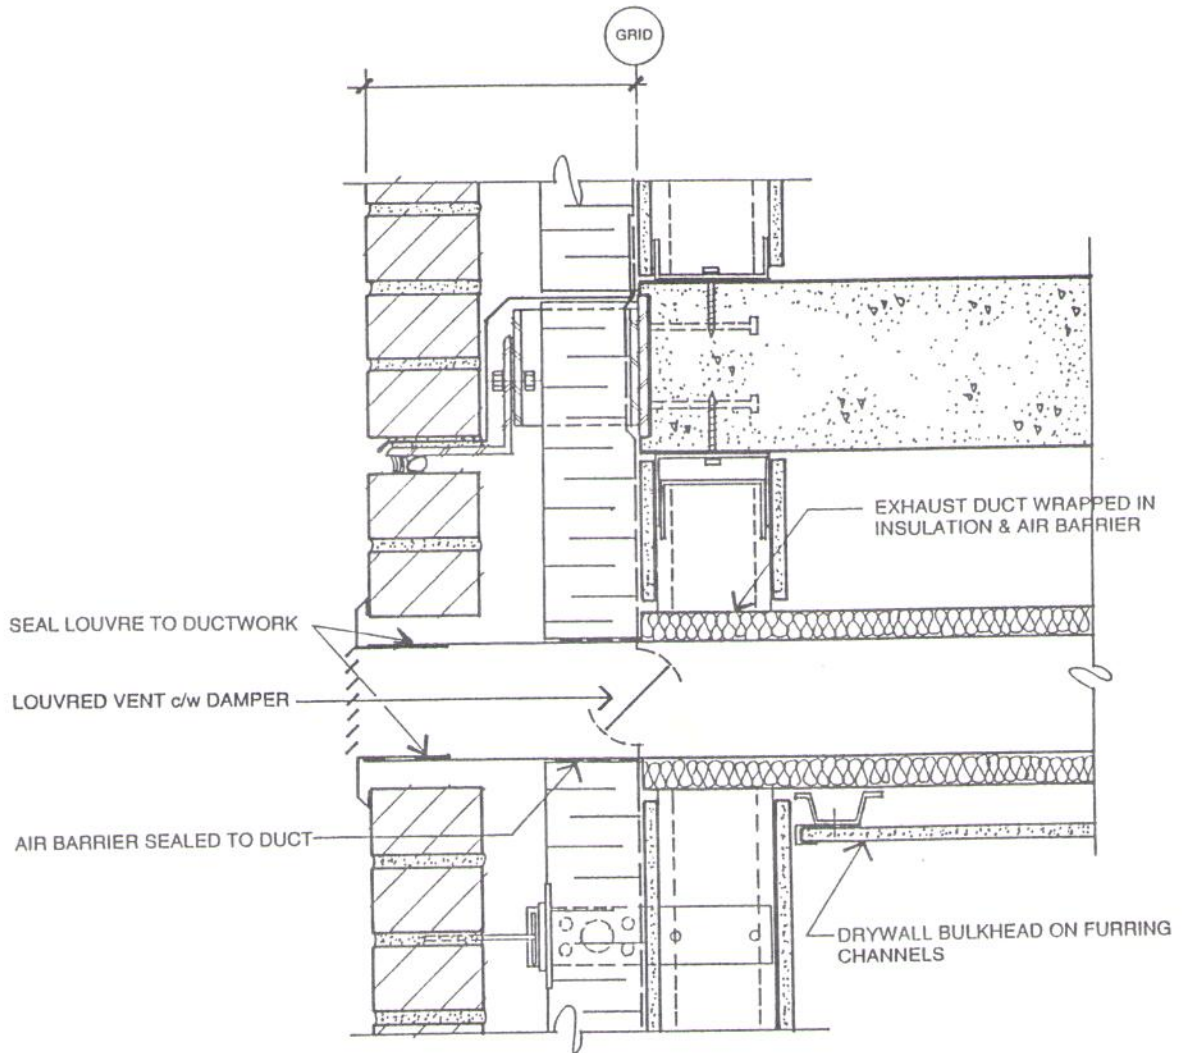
Brick Veneer/Steel Stud Exhaust Vent Detail
